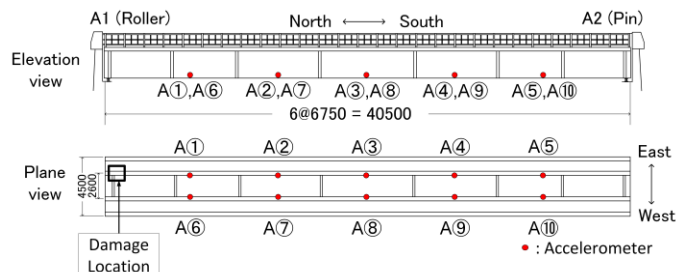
Observation bridge and sensor deployment. (unit: mm)
